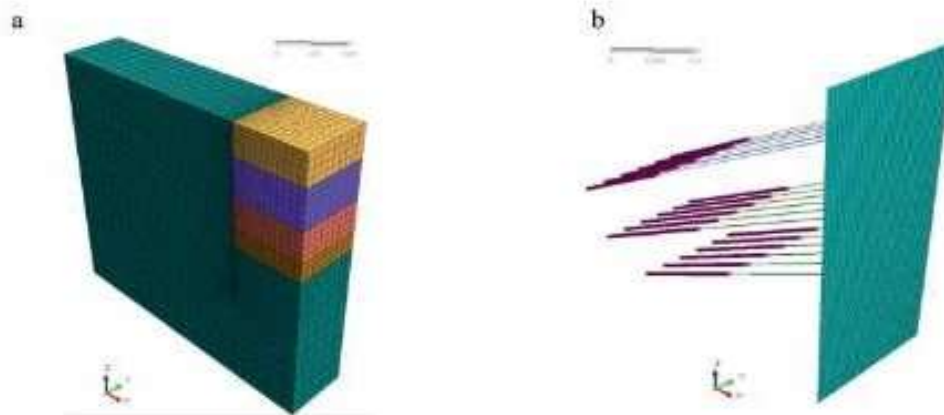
Trench wall design scheme: a – general configuration, b – an image of anchored trench wall.
